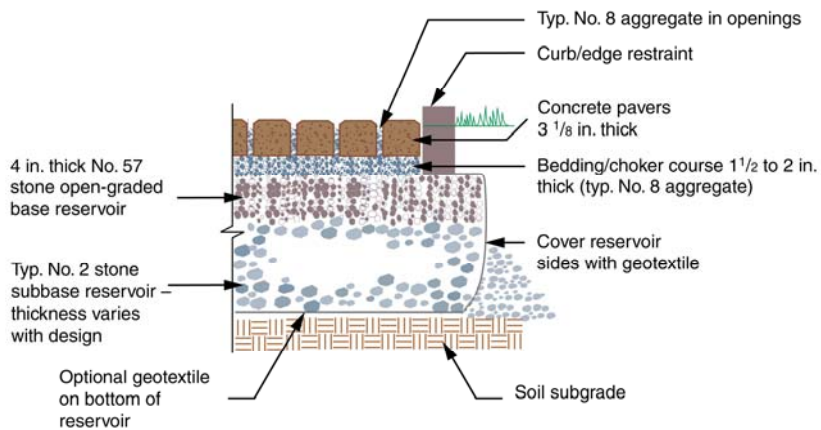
Typical Permeable Interlocking Concrete Pavement
